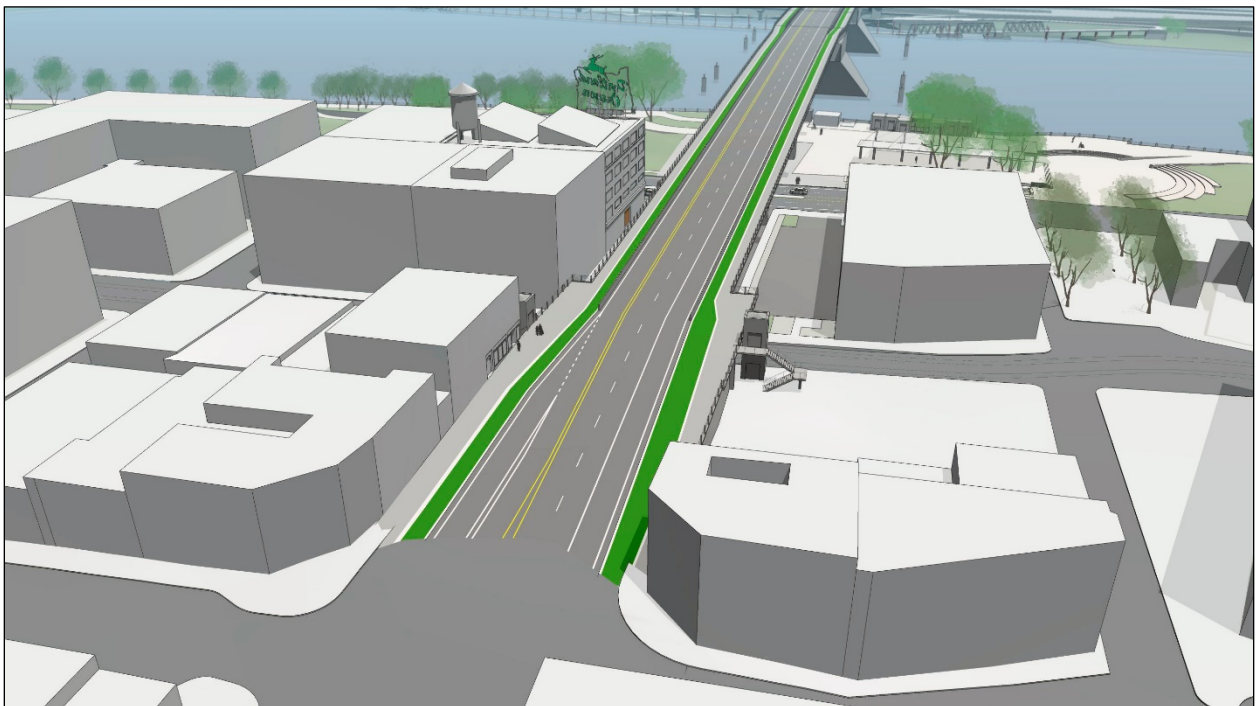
Reed Building, artist's rendering of replacement west approach span, aerial view looking northwest (Fat Pencil Studio, 2021).
